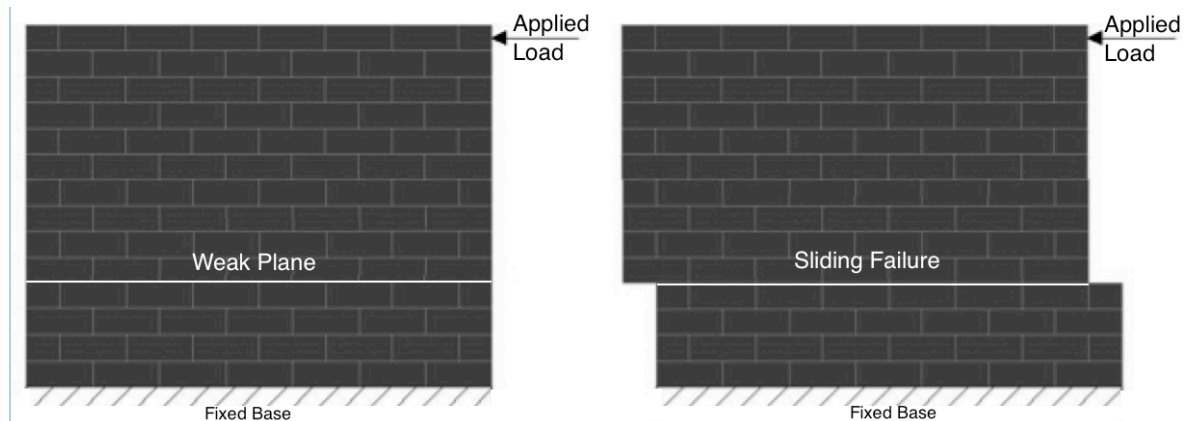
Shear Slip due to a weak plane between masonry layers
